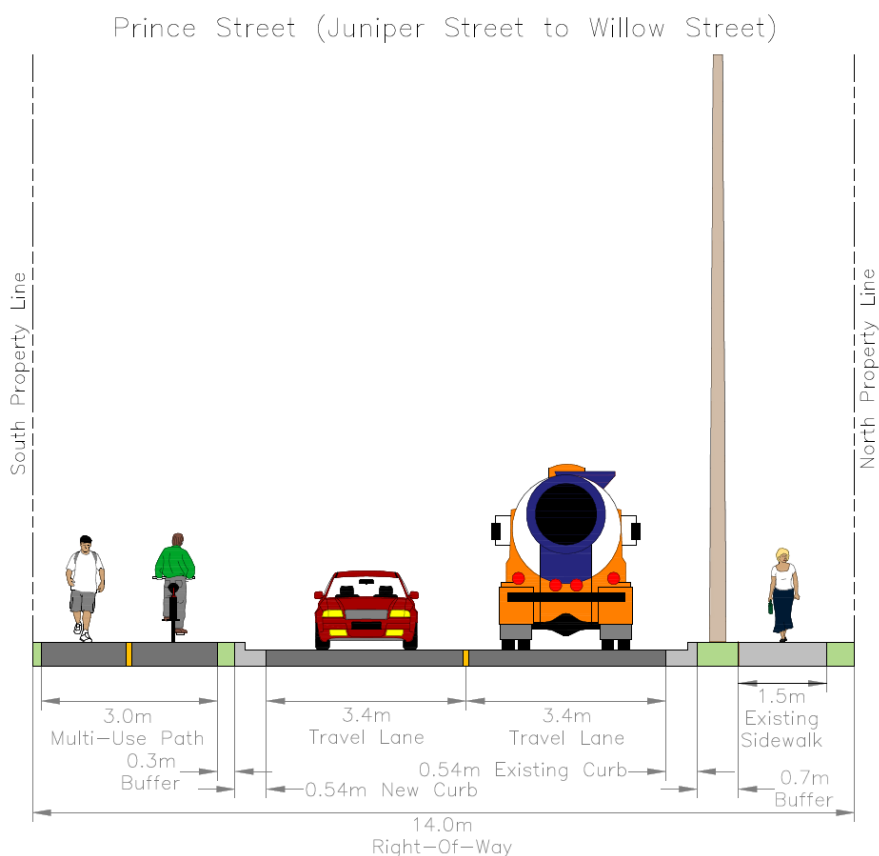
Prince Street between Juniper Street and Willow Street, Revised Cross Section
